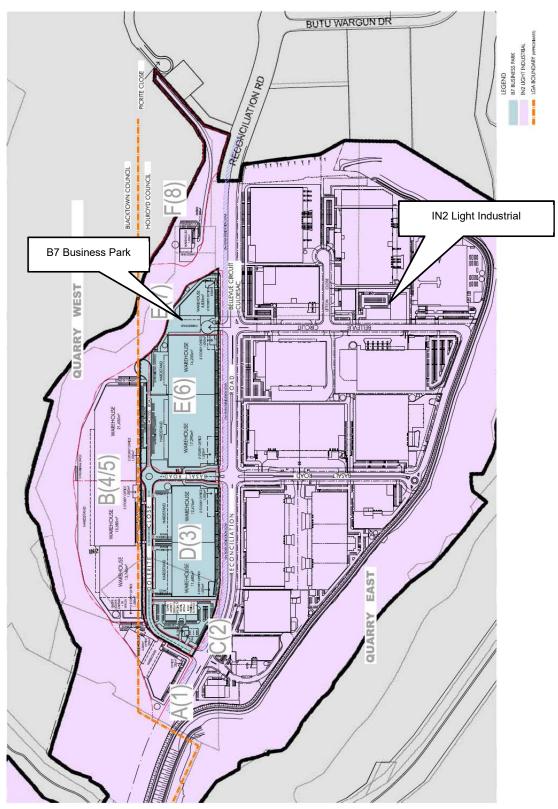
Zoning Plan (showing original masterplan layout) (Source: Nettleton Tribe)
